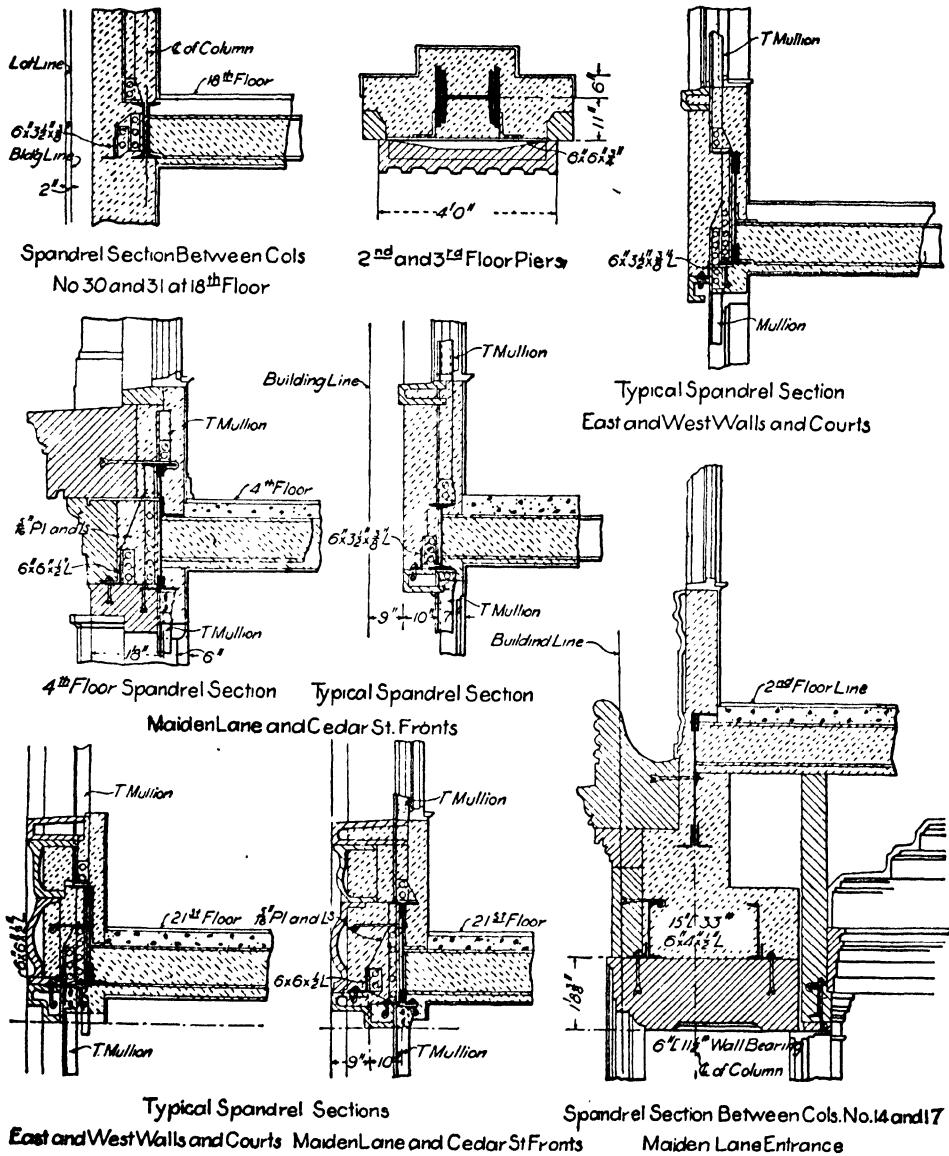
DETAILS OF WALL CONSTRUCTION, UNITED FIRE COMPANY'S BUILDING, NEW YORK. (Eng. Record, Dec. 9, 1911.)
